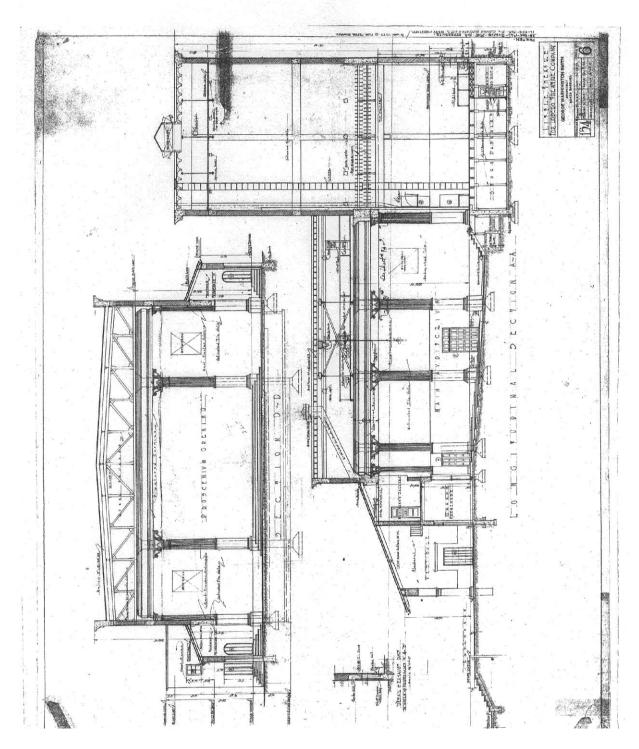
Longitudinal Section A-A, facing west showing proposed esplanade and steps to Canon Perdido sidewalk (George Washington Smith, "Little Theatre for Lobero Theatre Company", Ops. 154, Sheet 6. "Sections". November 7, 1923)
